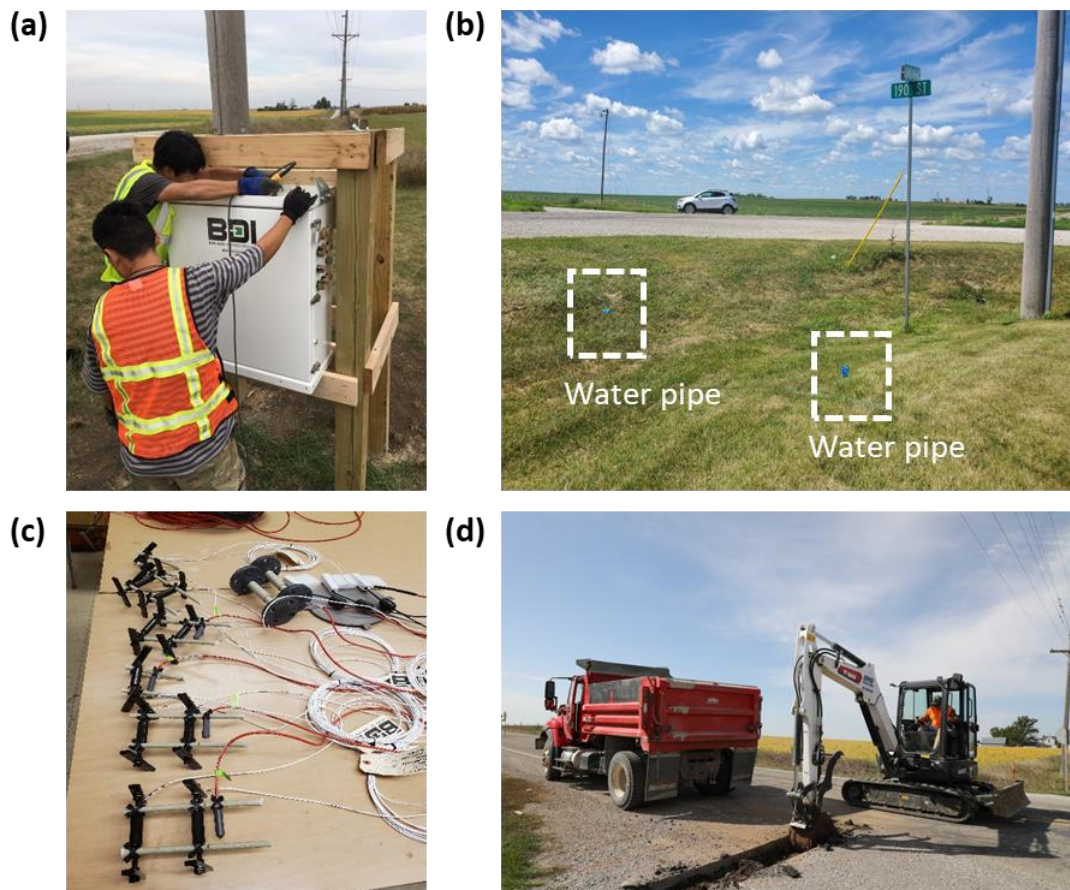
Activities prior to data acquisition system installation: (a) installing a wooden structure, (b) investigating underground facilities via Iowa One Call, (c) preparing sensor trees, and (d) arranging an excavator
